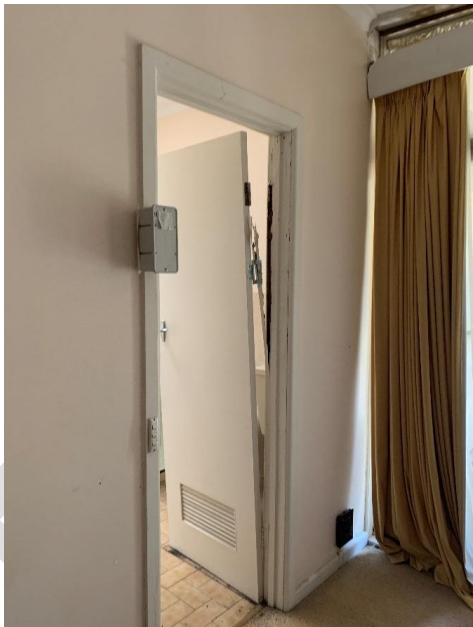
Second non-original bathroom adjoining non-original second bedroom.
